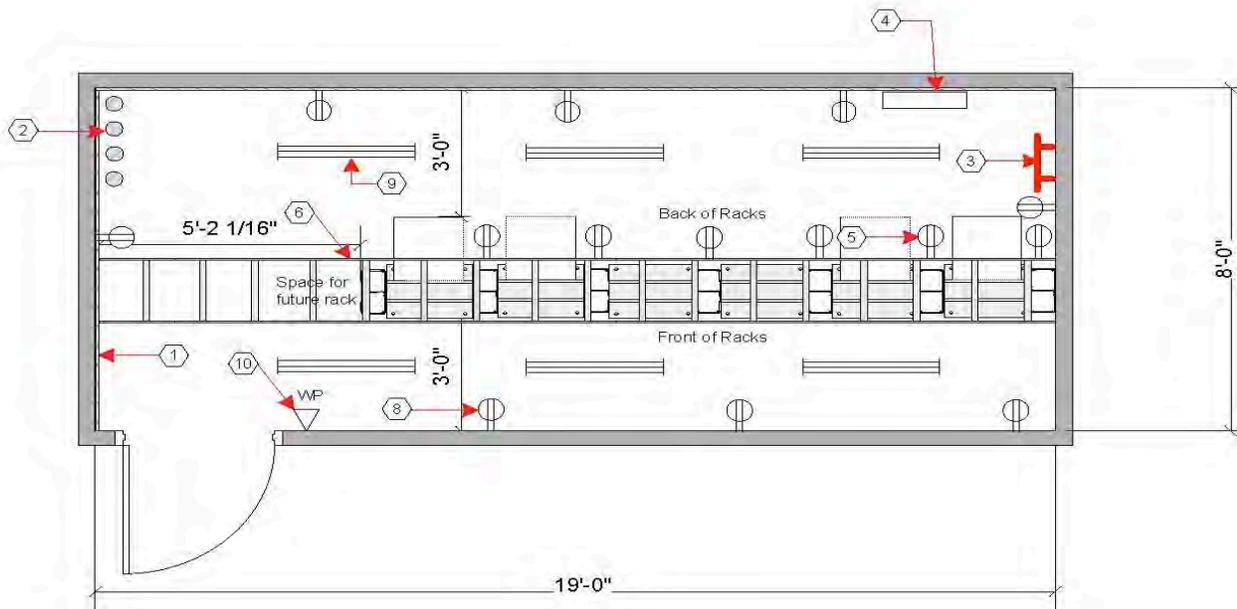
Typical Telecommunications Equipment Room (TER) Plan View
